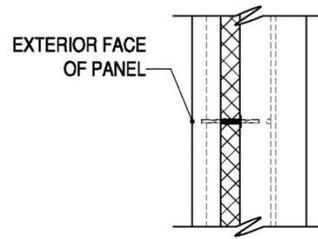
Generic Cross Section of Precast/Prestressed Insulated Wall Panel
